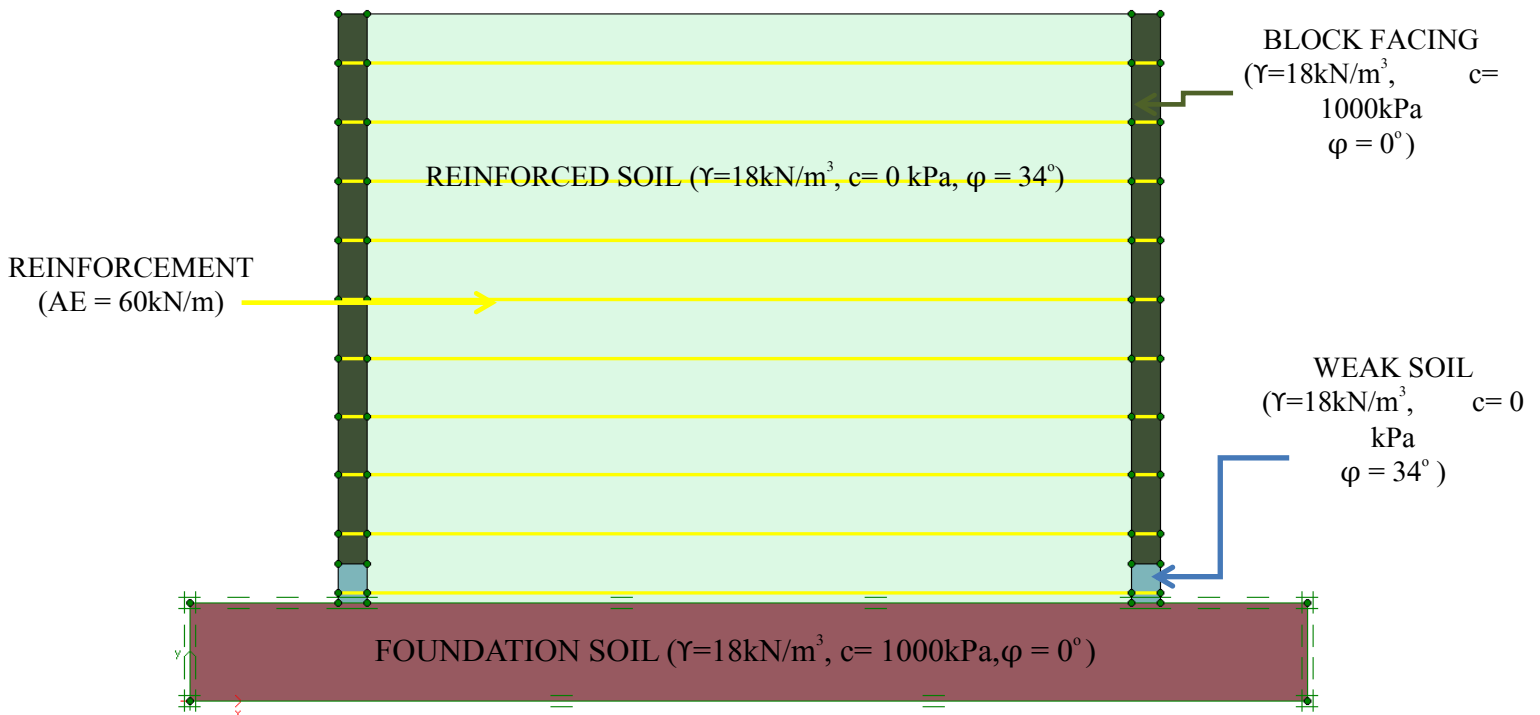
PLAXIS Model of Back-to-Back Reinforced Retaining wall
